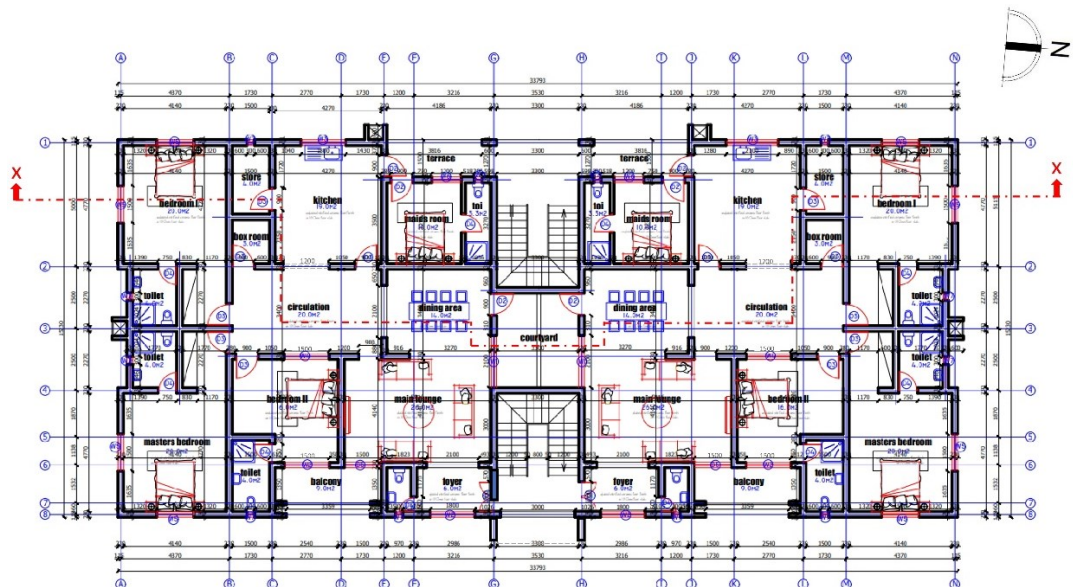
Typical Ground, First, Second and Third Floor Plan of Case Study Two (Ivy Apartments)
